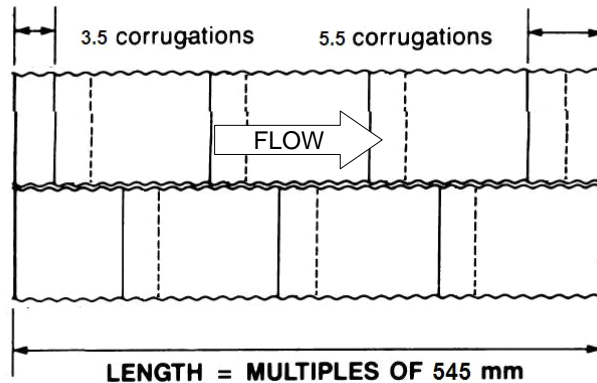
Assembly pattern for flanged nestable CSP used in model.
